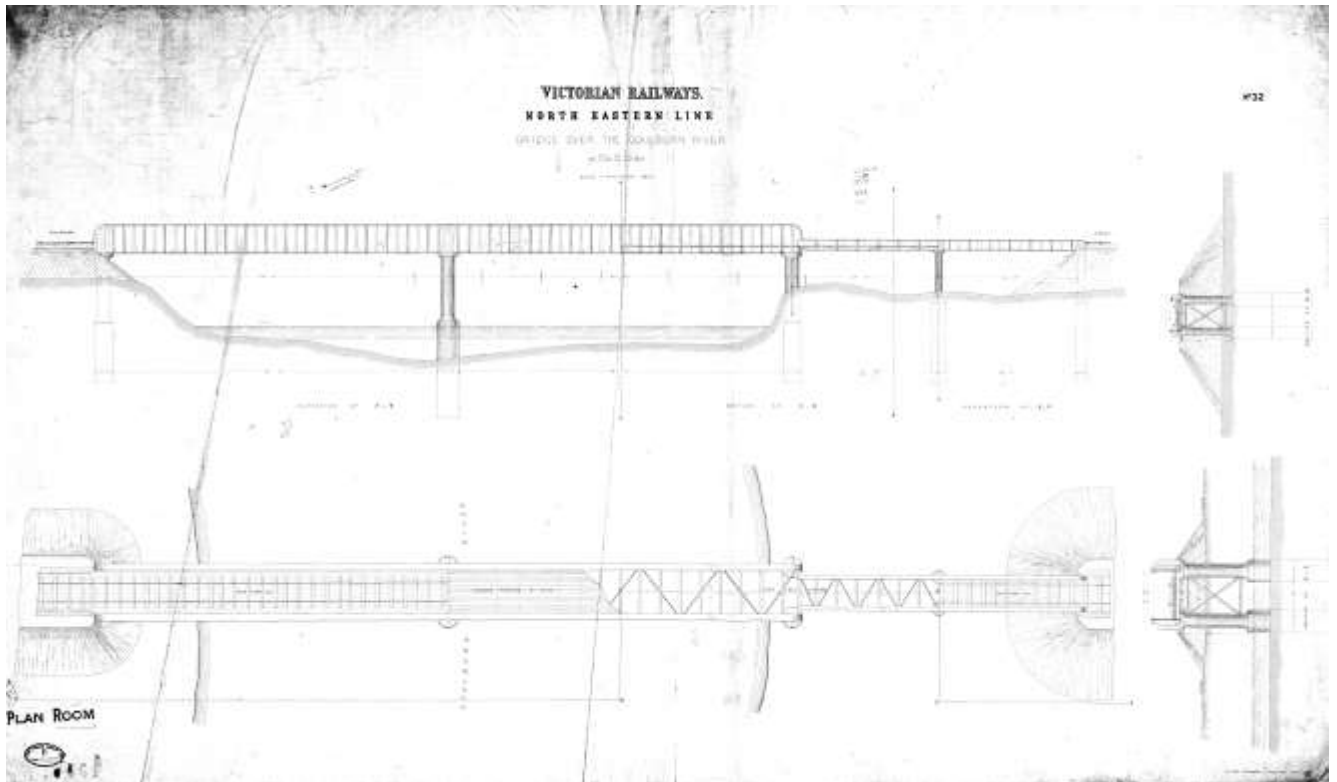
Original Construction Drawing 32 Victorian Railways 1870 Source: VicTrack Drawings
